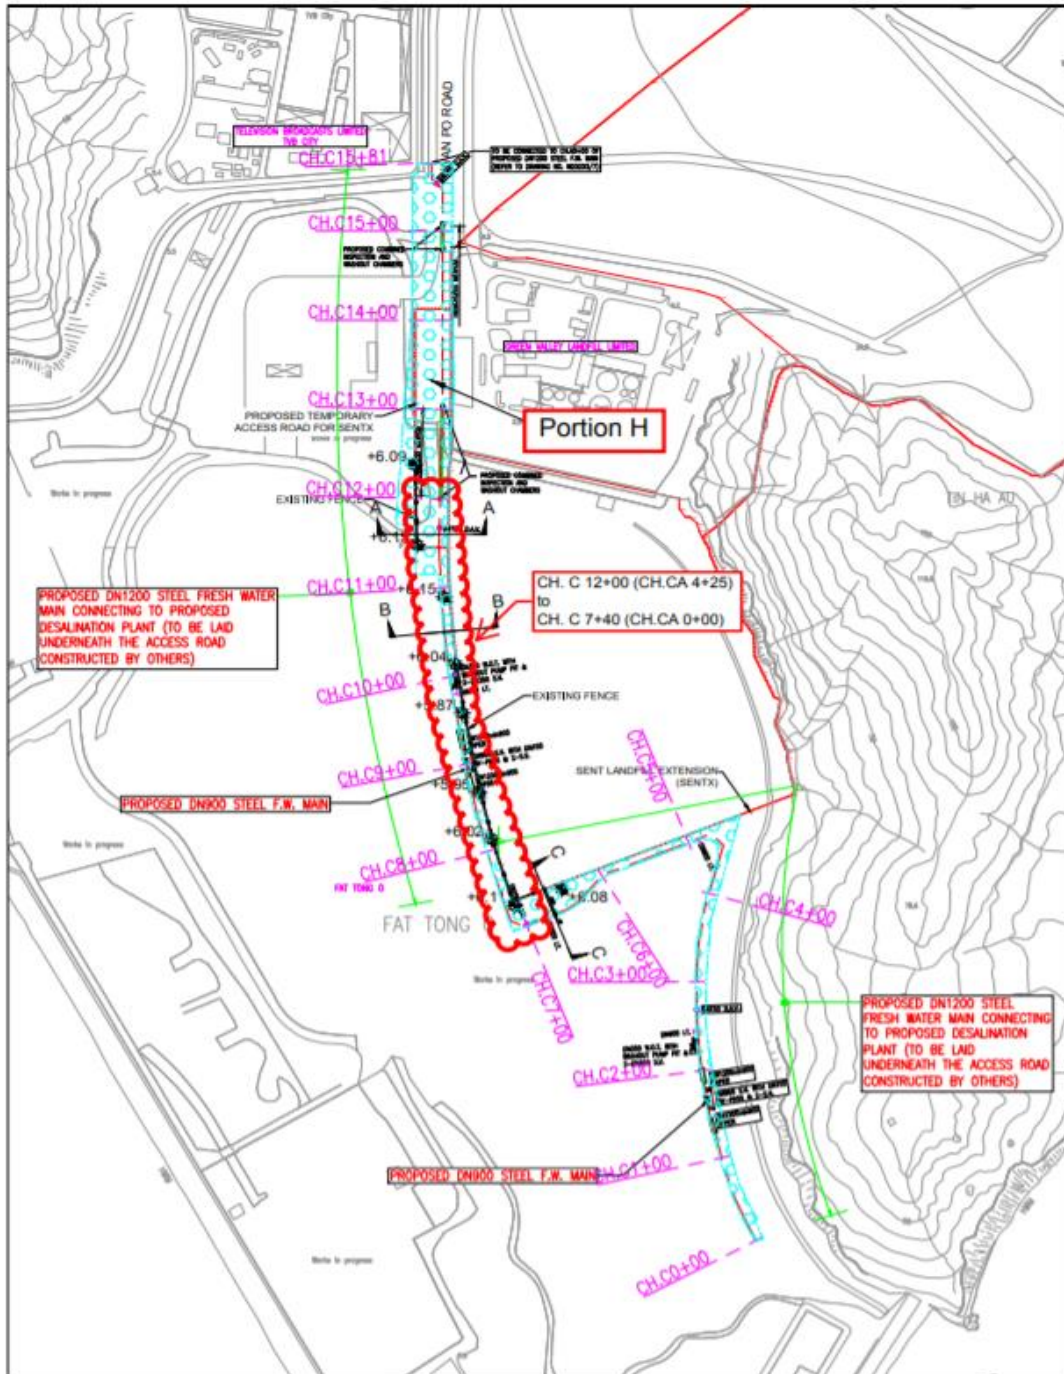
Location Plan for Portion H– CH.C 7+40~CH.C 12+00 (CH.CA 0+00 ~ CH.CA4+25)
